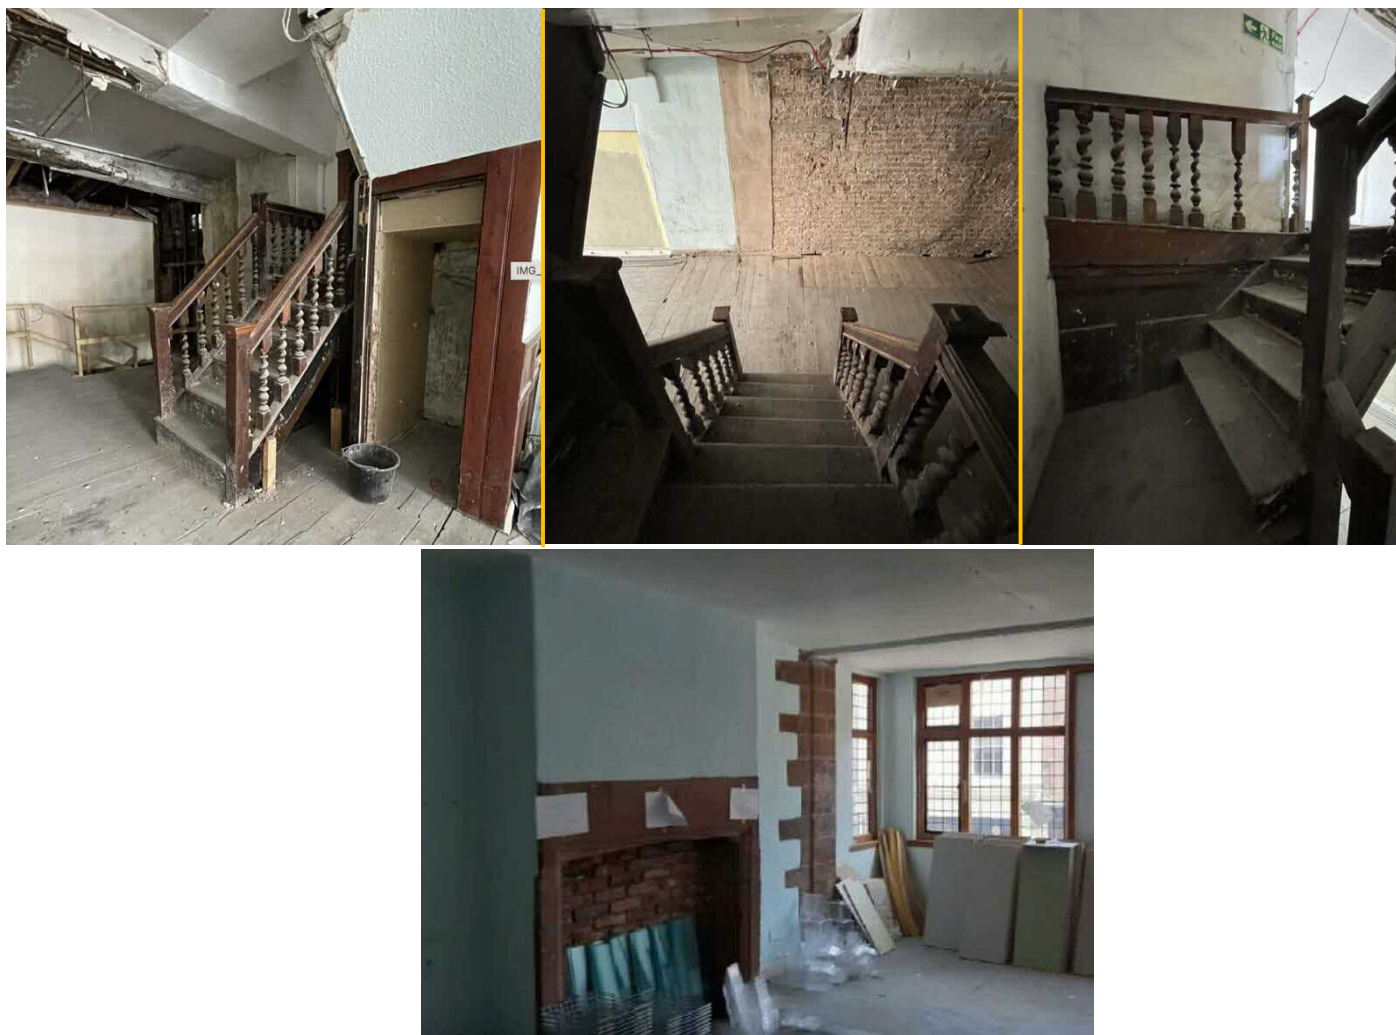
The 17th century staircase on the Row plus one level; and the sandstone fireplace surround.
